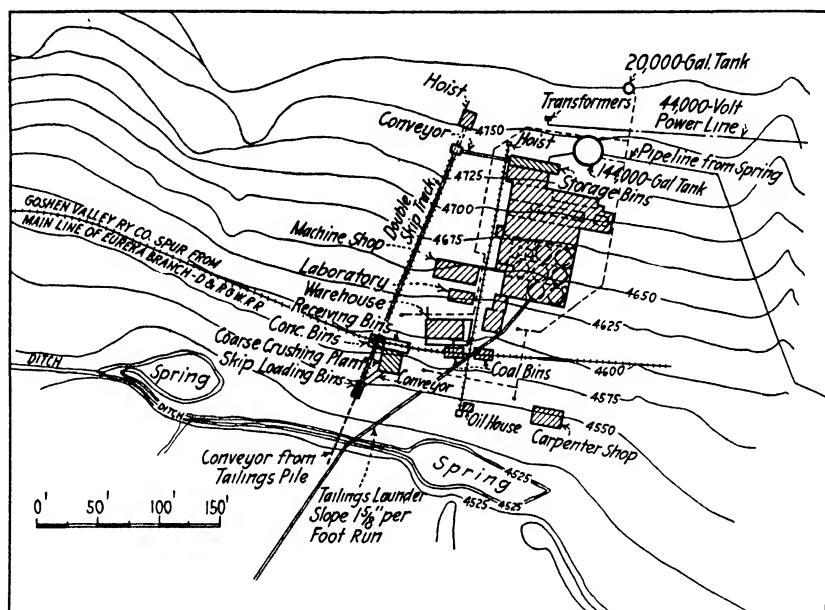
GENERAL ARRANGEMENT OF PLANT.
